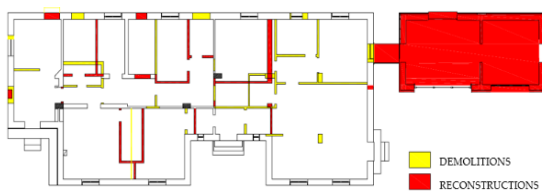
Demolitions and reconstructions conducted on the study building for the refurbishment and expansion of the building
